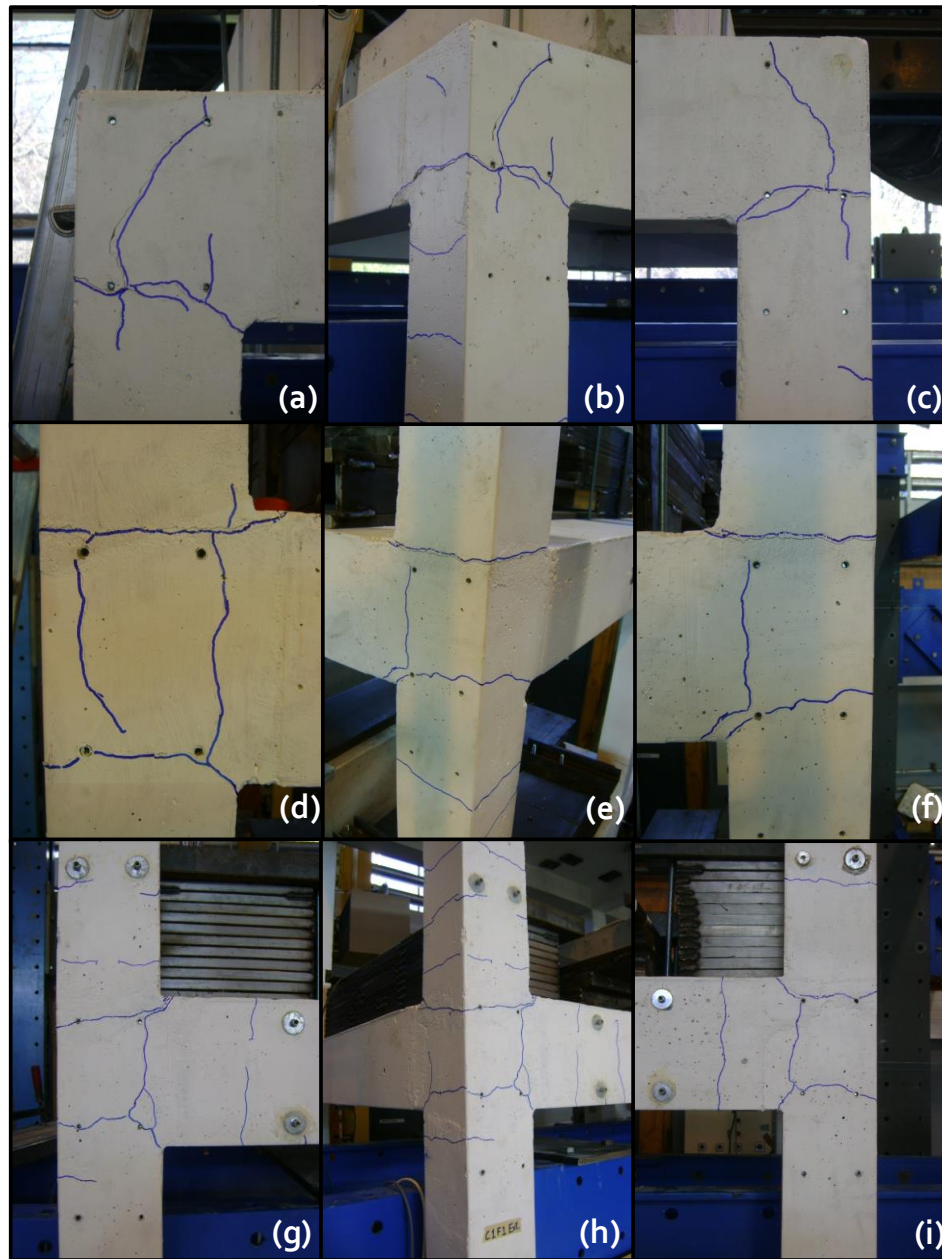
Observed damage after Test 1.3 n corner beam column joints: (a) top floor, long span joint front view, (b) top floor, long span joint 3D view, (c) top floor, short span joint front view, (d) second floor, long span joint front view, (e) second floor, long span joint 3D view, (f) second floor, short span joint front view, (g) first floor, long span joint front view, (h) first floor, long span joint 3D view, (i) first floor, short span joint front view.
